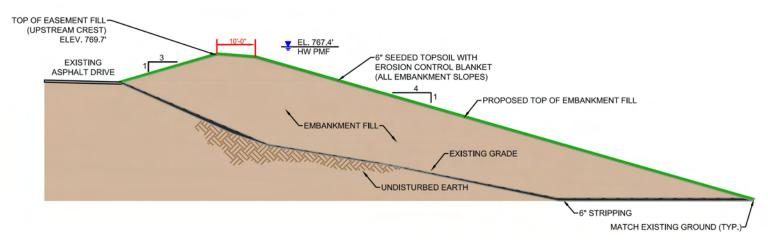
Watts Bar Dam – Raised Earthen Embankment Concept for Segments WB-1 and WB-2
